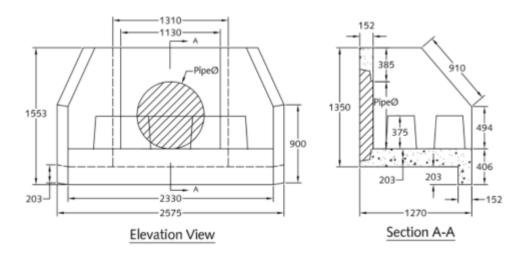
Prefabricated Concrete Headwall Unit [6].
